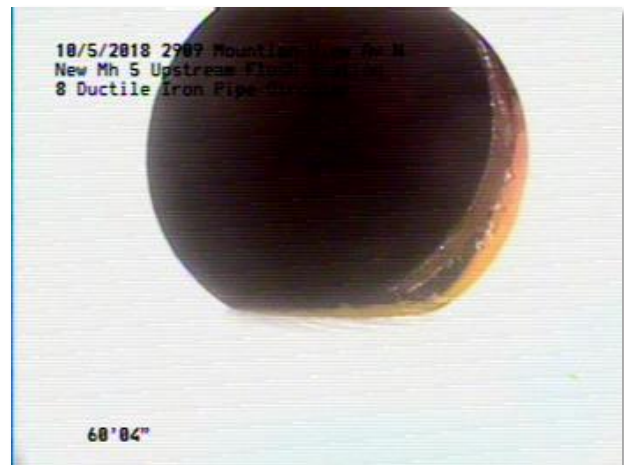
Infiltration at offset joint between new and old pipe segment at approximately 60 feet upstream of Manhole 5.
